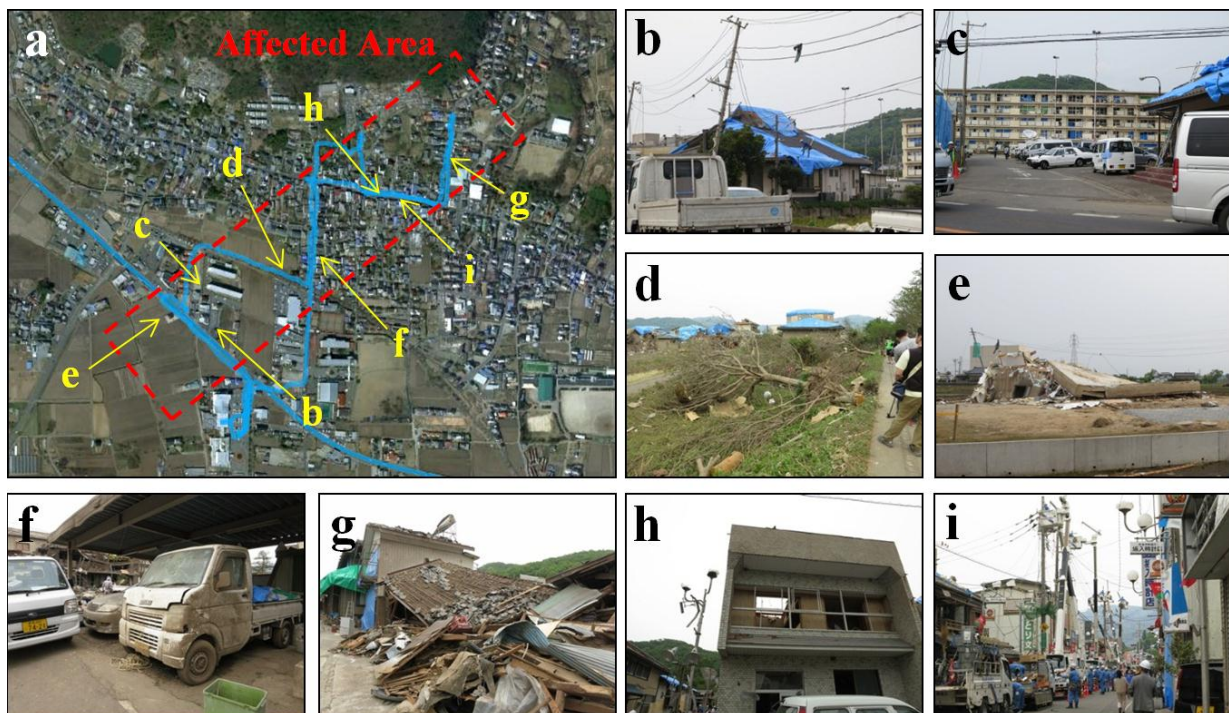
(a) The area of field survey in Hojo district of Tsukuba City and photo shooting locations, (b) Blue-sheet on the roof, (c) Damage on the side wall of the apartment building, (d) Fallen trees along the street, (e) Overturned wooden house with its concrete base, (f) Cars stained with tornado's mud water, (g) Buildings that reduced to debris, (h) Brown-off of the roof (the sky is seen from the window), (i) Restoration work of electric poles and cables.
